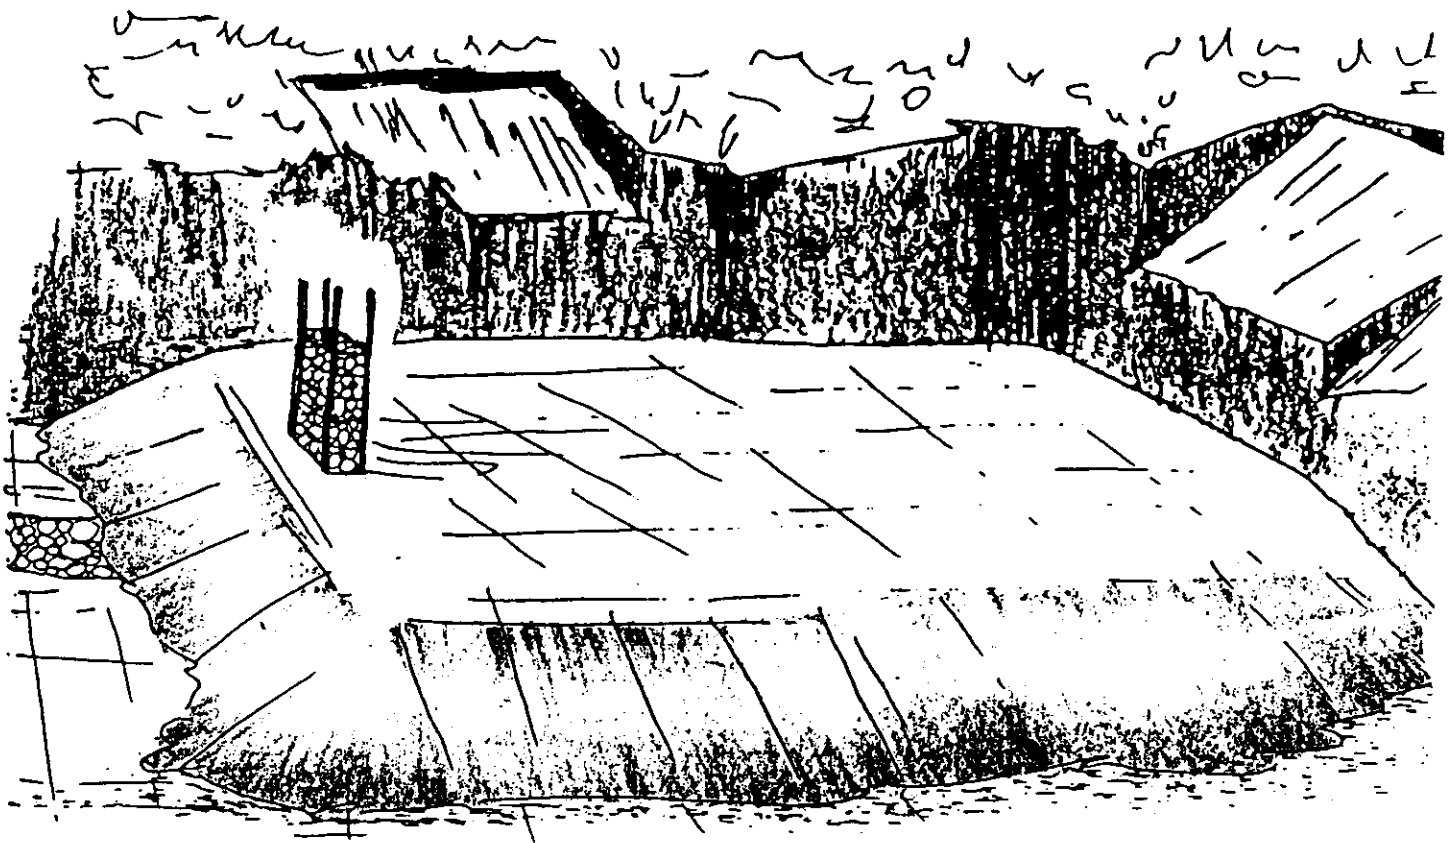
CONSTRUCTION OF A NEW CELL
